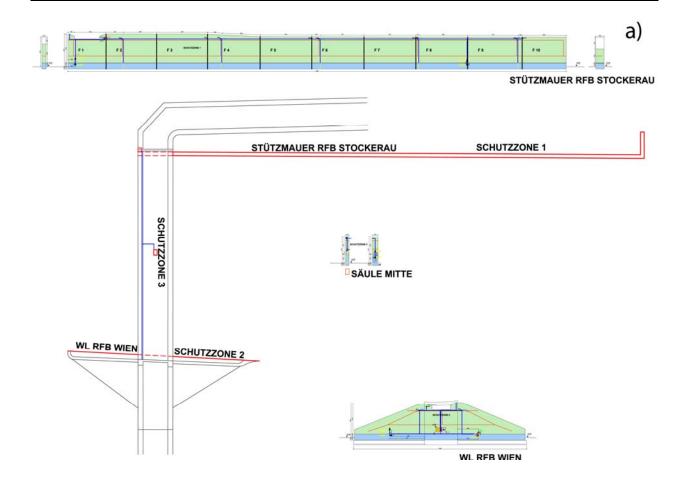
Schematic representation of the CP protection zones & anode system: B2134, sustaining wall – zone 1, bridge column – zone 3, abutment – zone 2.
